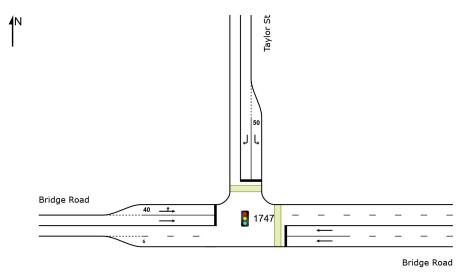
Existing PM Peak Layout of Bridge Road and Taylor St
